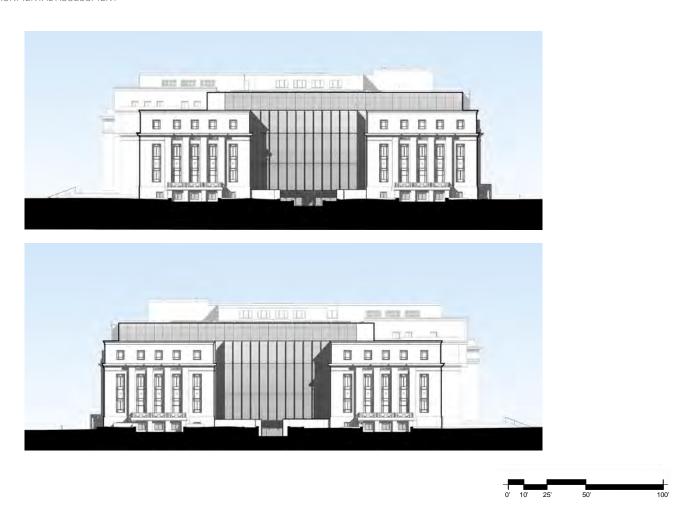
Alternative 2: East (top) and west (bottom) elevations of the Eccles Building.
